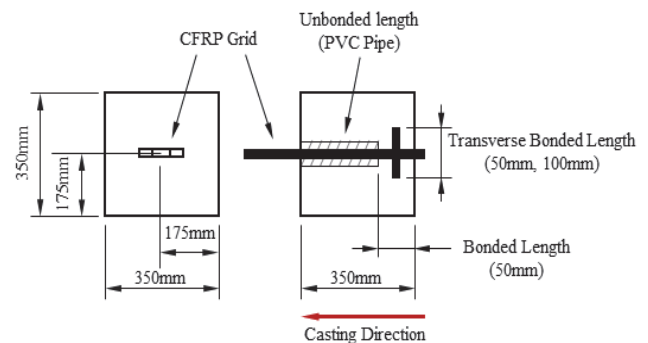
Grid type CFRP reinforcement pull out test specimens
